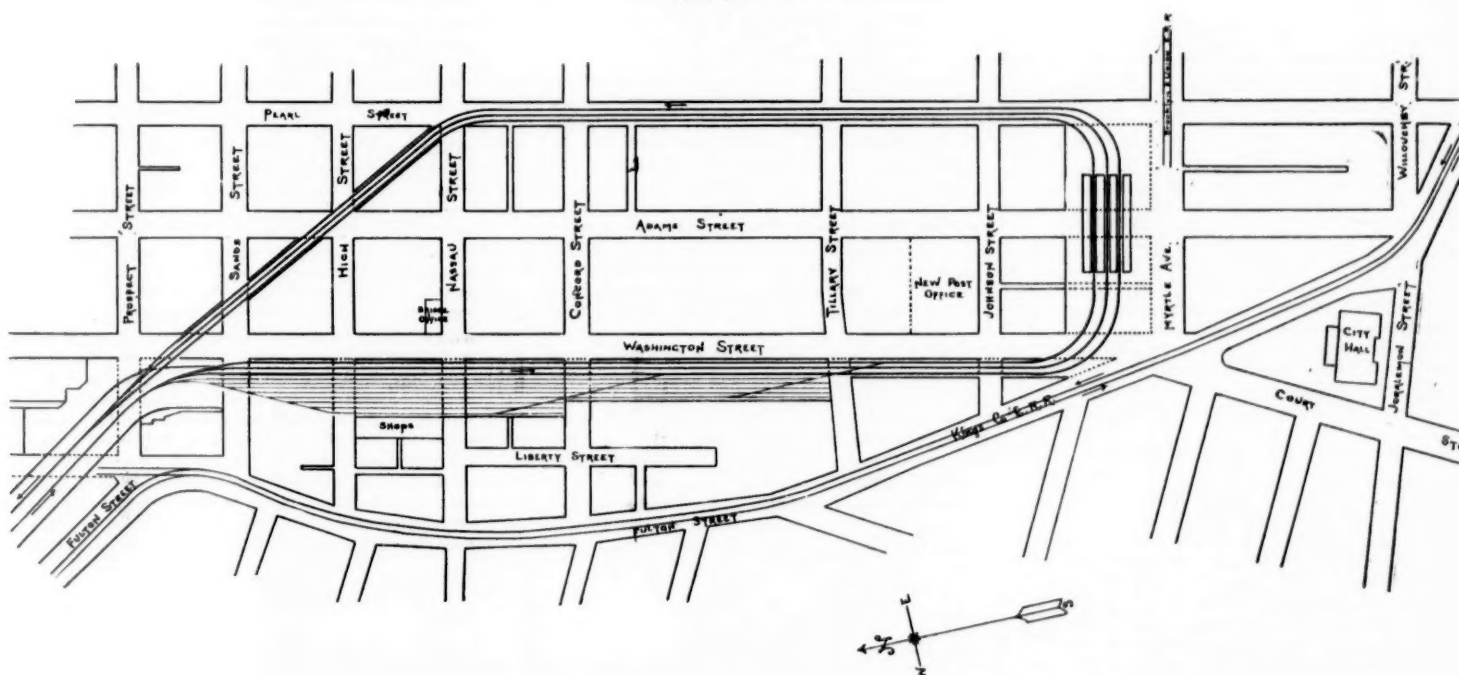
PROPOSED BROOKLYN TERMINAL, NEW YORK & BROOKLYN BRIDGE RAILWAY.
